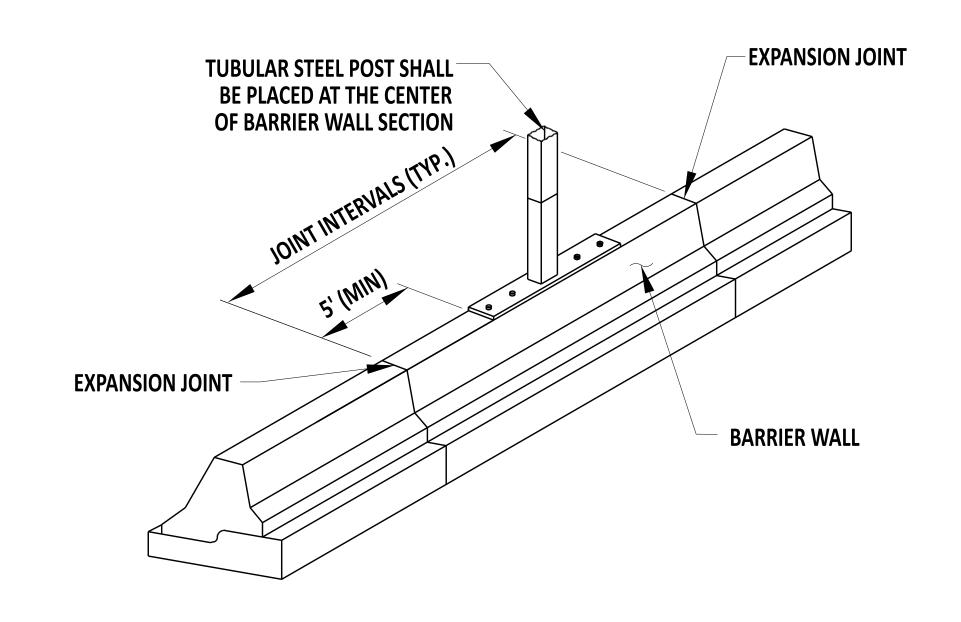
DETAIL 'A' - SIDE VIEW CONCRETE BARRIER
